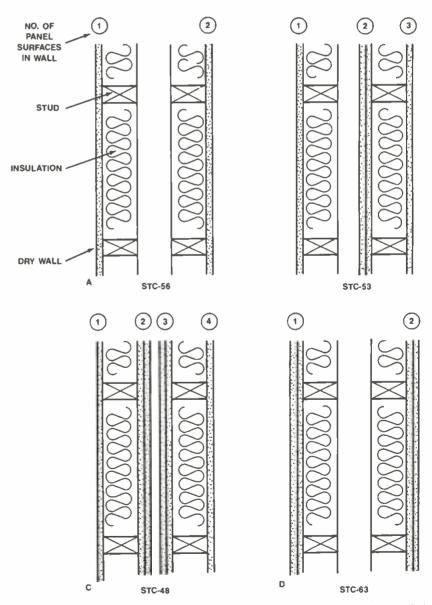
Plan view of a simple double stud partition (a). Adding dry wall will actually lower its sound isolation if it creates a triple (b) or quadruple (c) wall. A mass-airspace-mass arrangement offers the best use of materials and space. Additional dry wall at the outer faces (d) increases attenuation dramatically.
